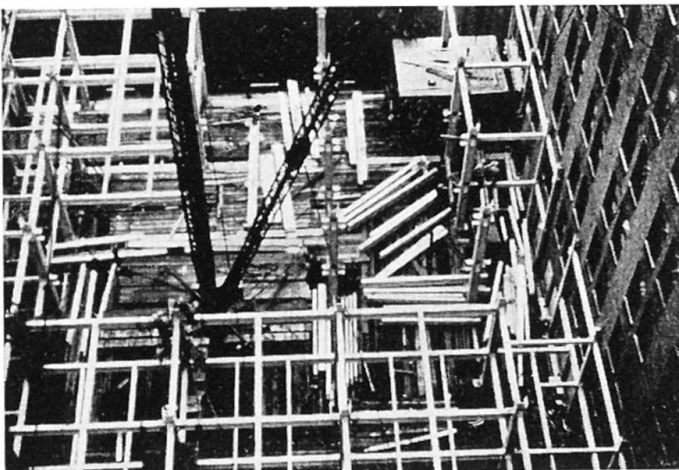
Erecting trusses completely assembled on the working floor, eliminates falsework.
